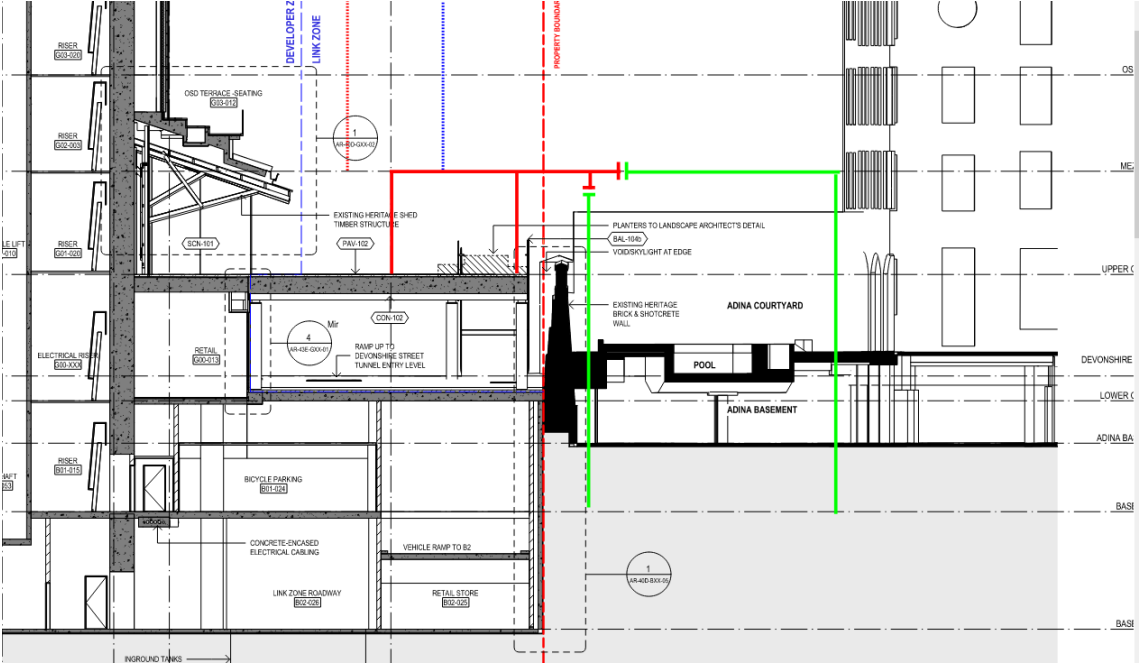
Indicative B-Class Hoarding Layout Plan – Adina Hotel Swimming Pool
